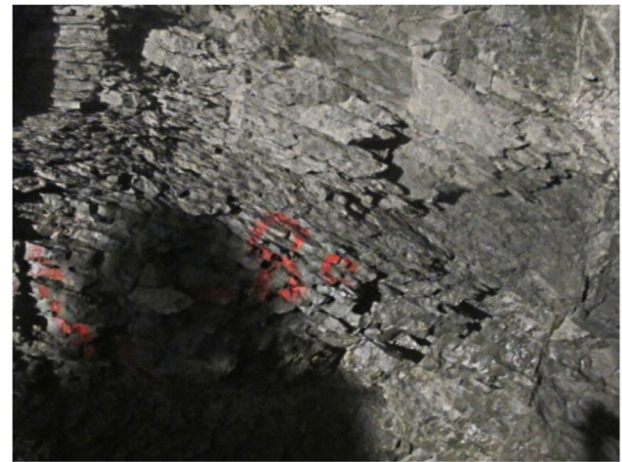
Photo of muddy shale at the sidewall of tunnel.
